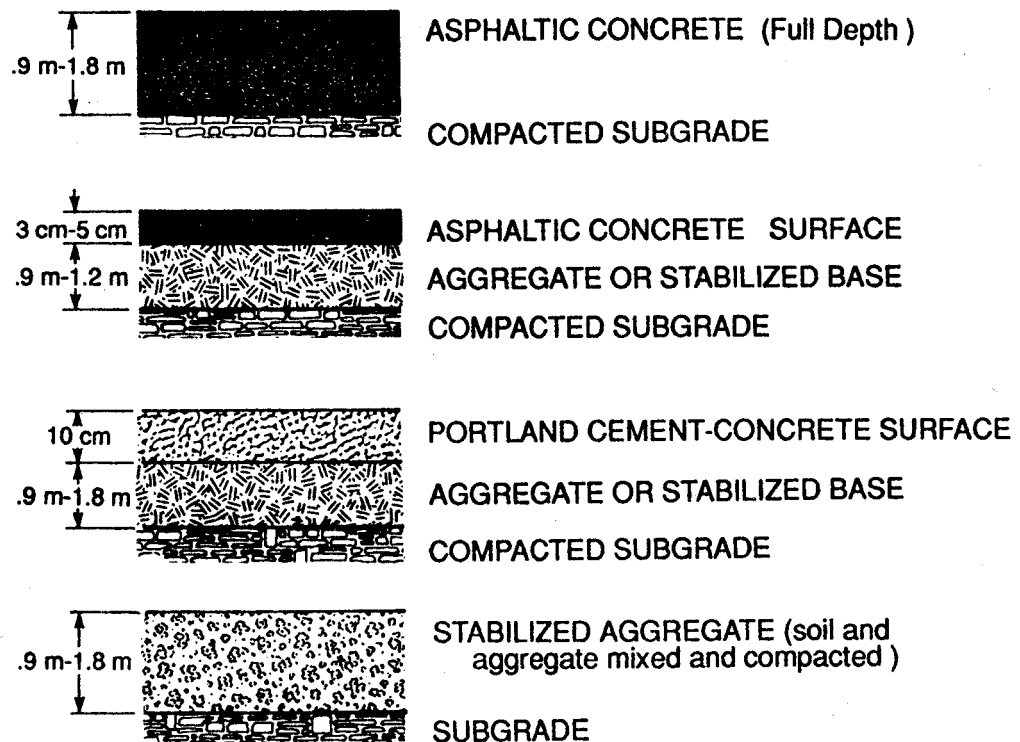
TYPICAL PATH DESIGN SECTIONS
